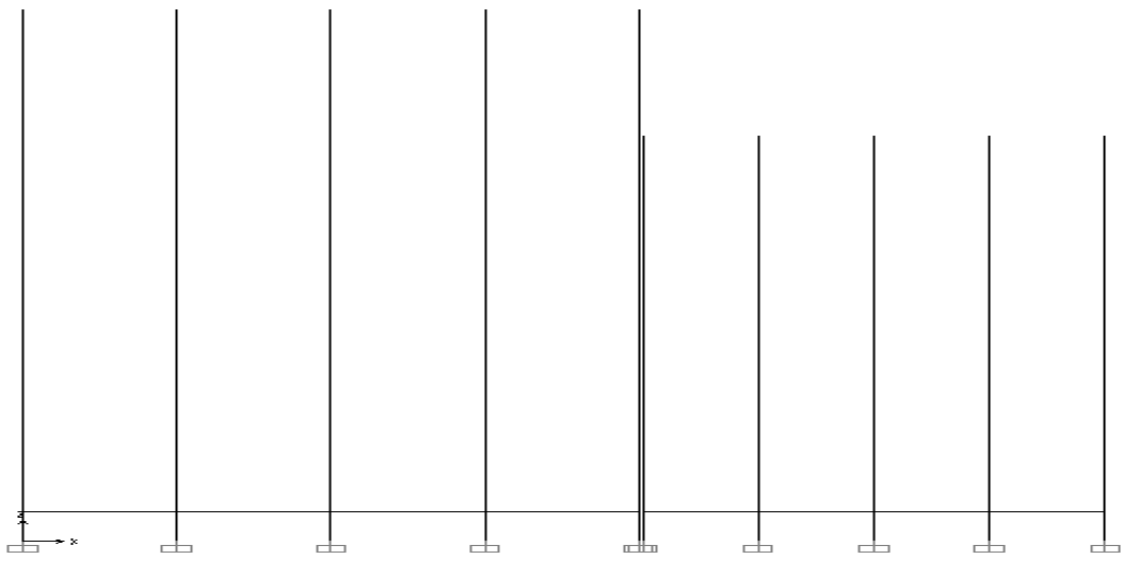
Elevation view of Flat slab system adjacent to Flat slab system
